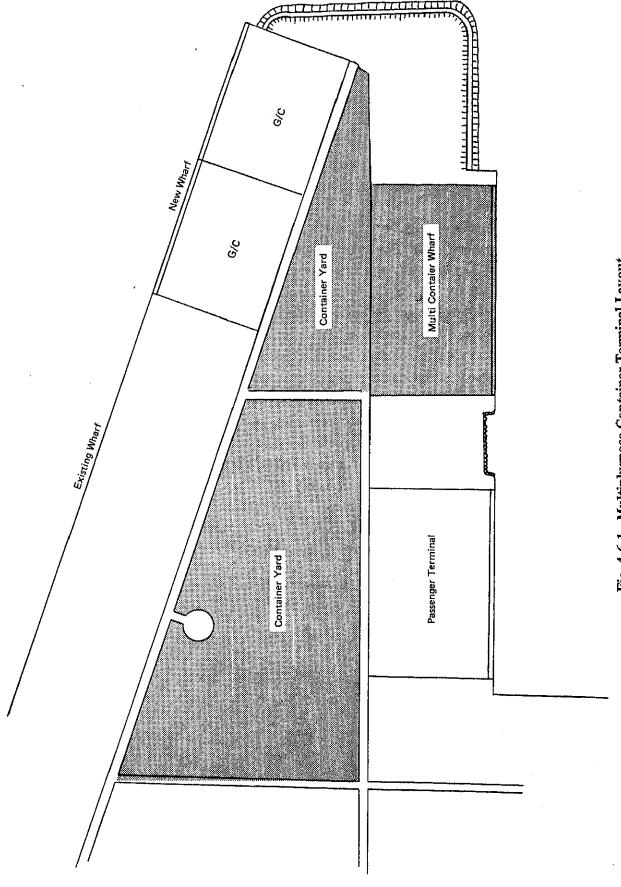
Multiplurpose Container Terminal Layout
